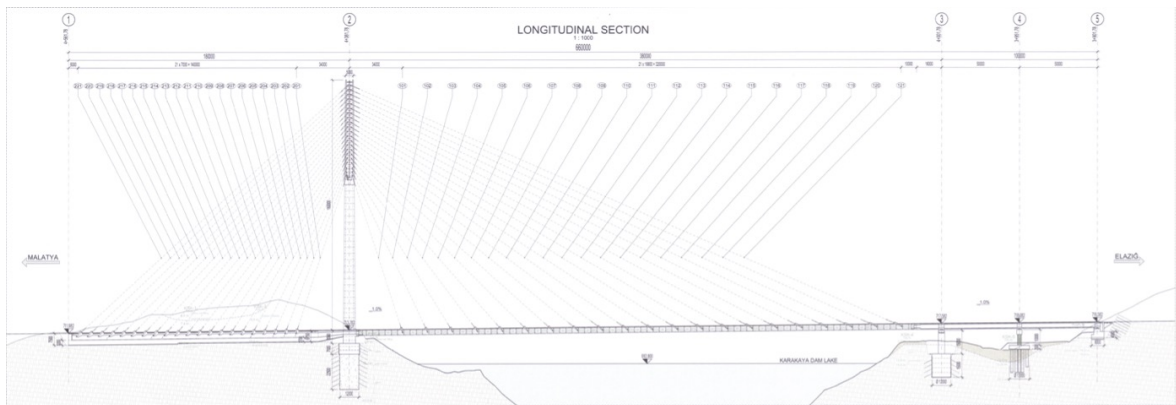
Longitudinal section of New Kömürhan Bridge.
